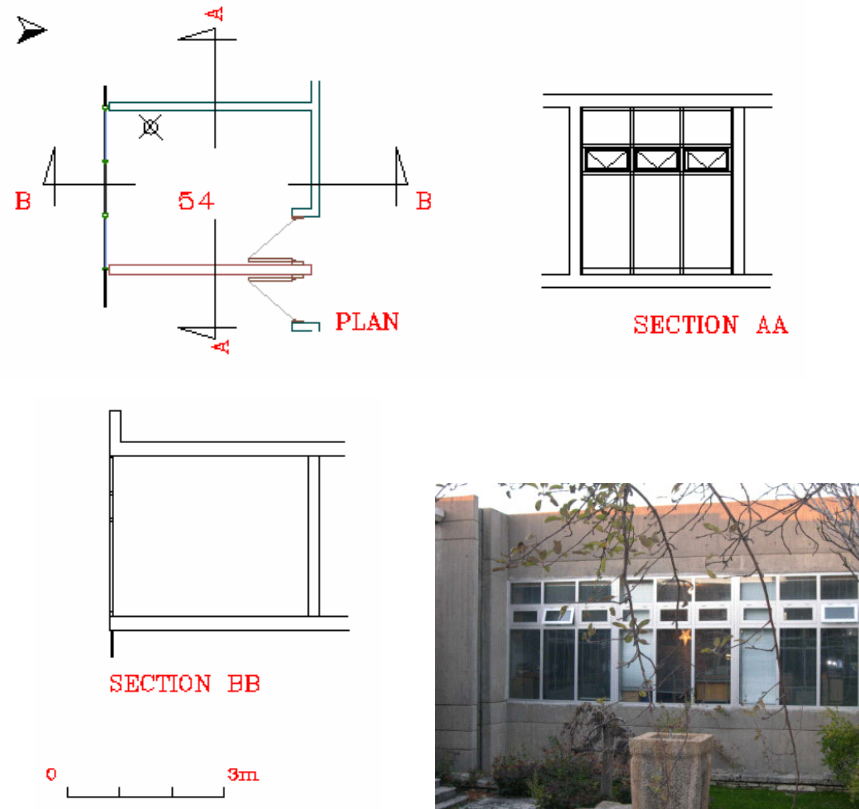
Floor plan, section AA, section BB and exterior view of Room 54.
